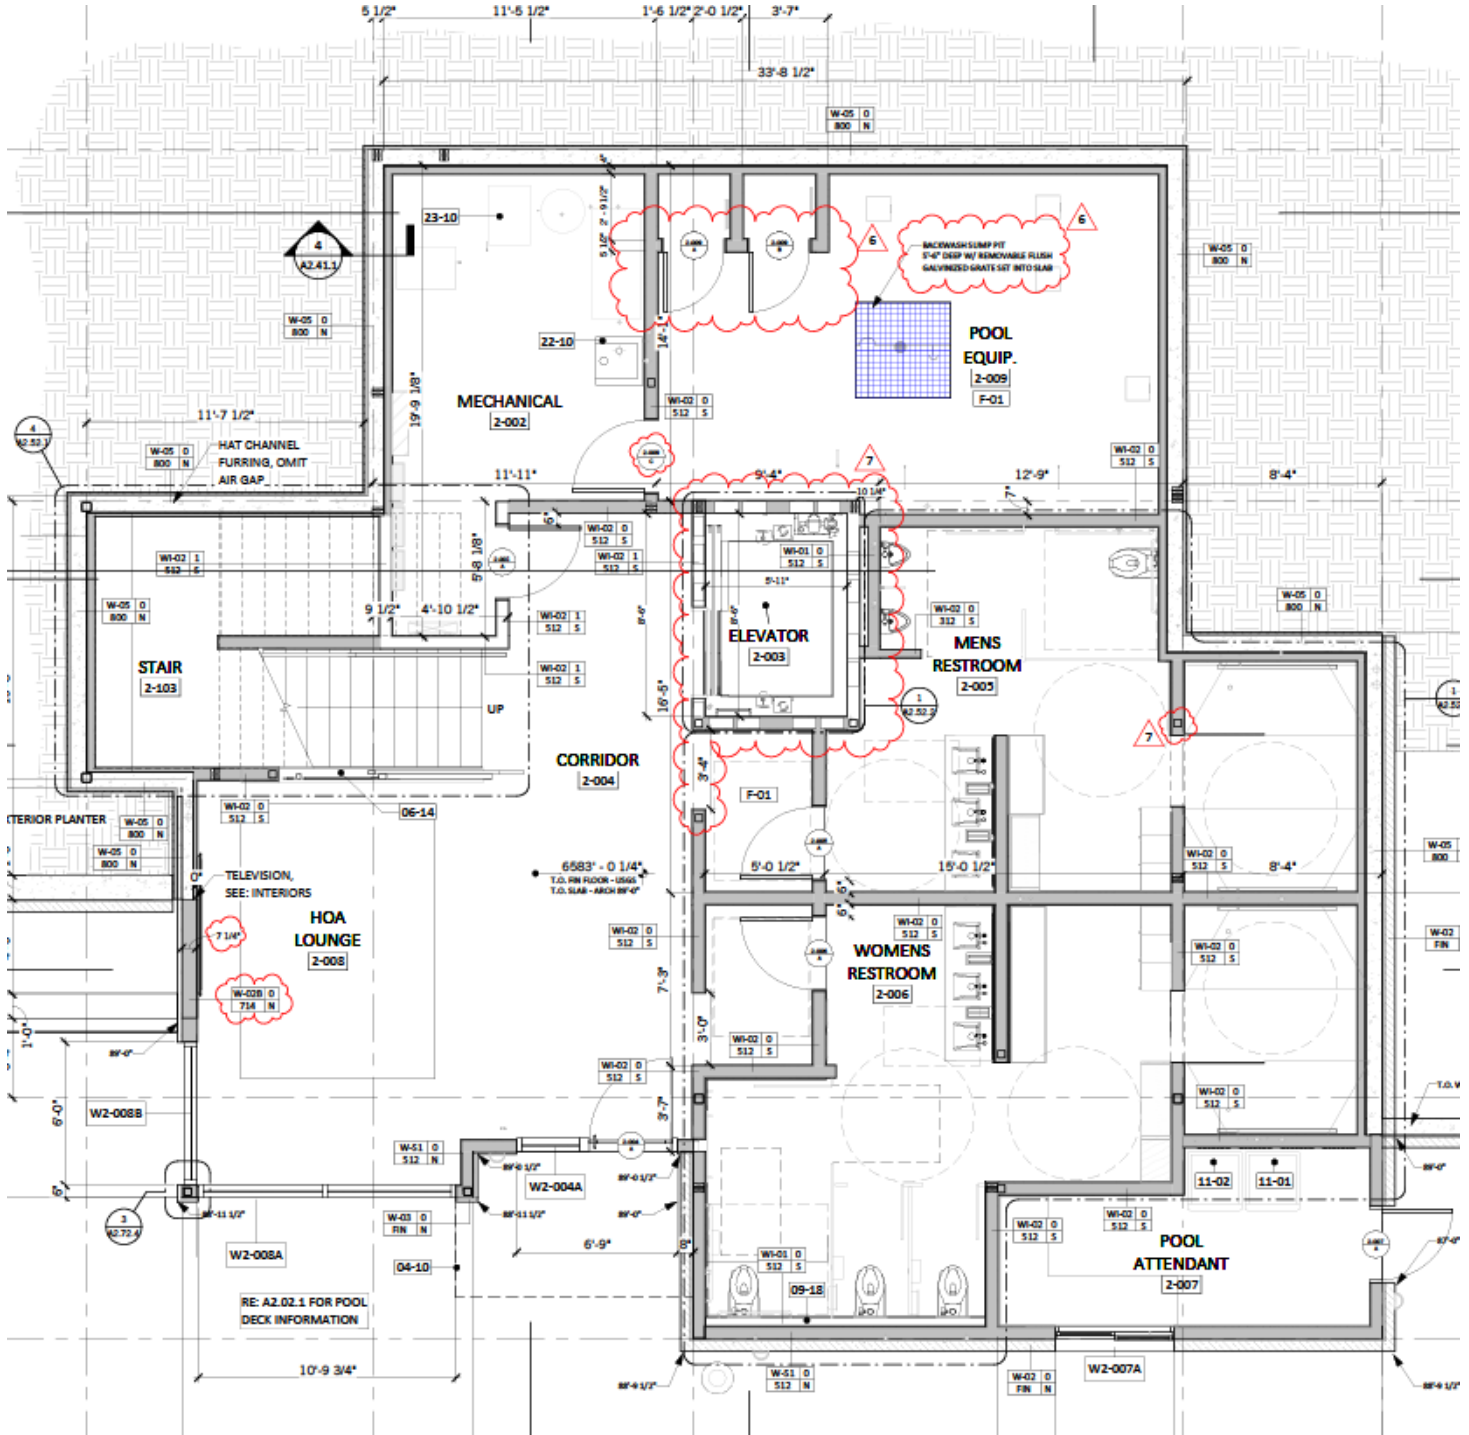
EXHIBIT D – Current and Proposed HOA Building Floor Plans
